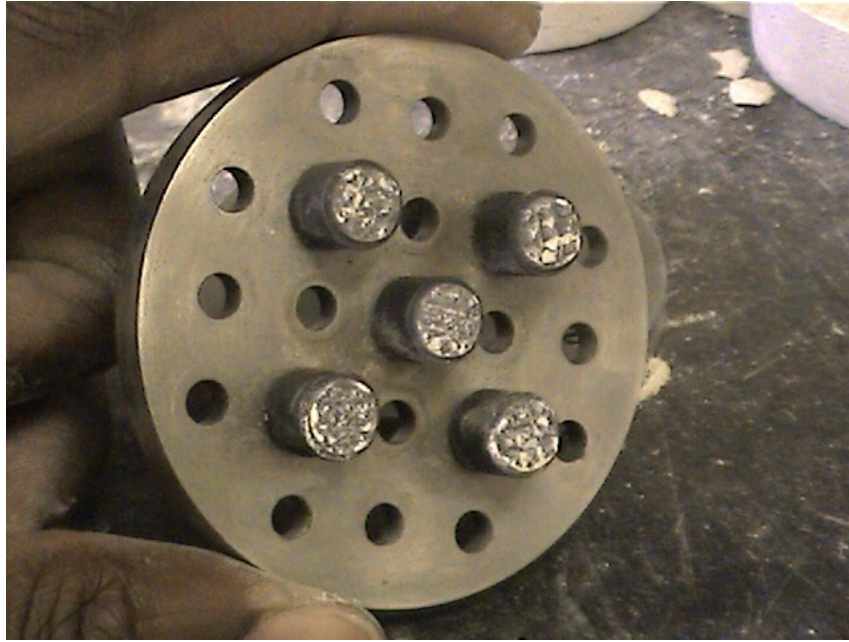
Load Assembly showing “5” Multiple Head Shear Stud Arrangement.
